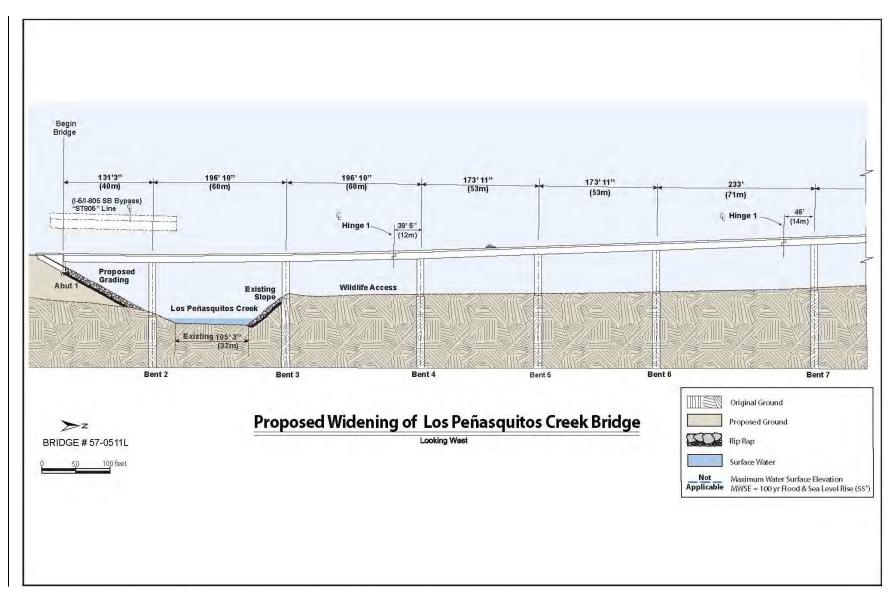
Los Peñasquitos Lagoon: Cross-sections for the Existing I-5 Bridge and Proposed 8+4 Buffer (Los Peñasquitos Creek)
